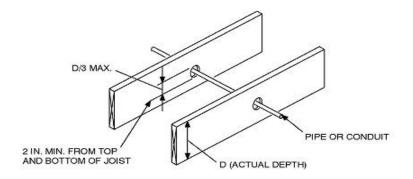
CUTTING, NOTCHING AND DRILLING
